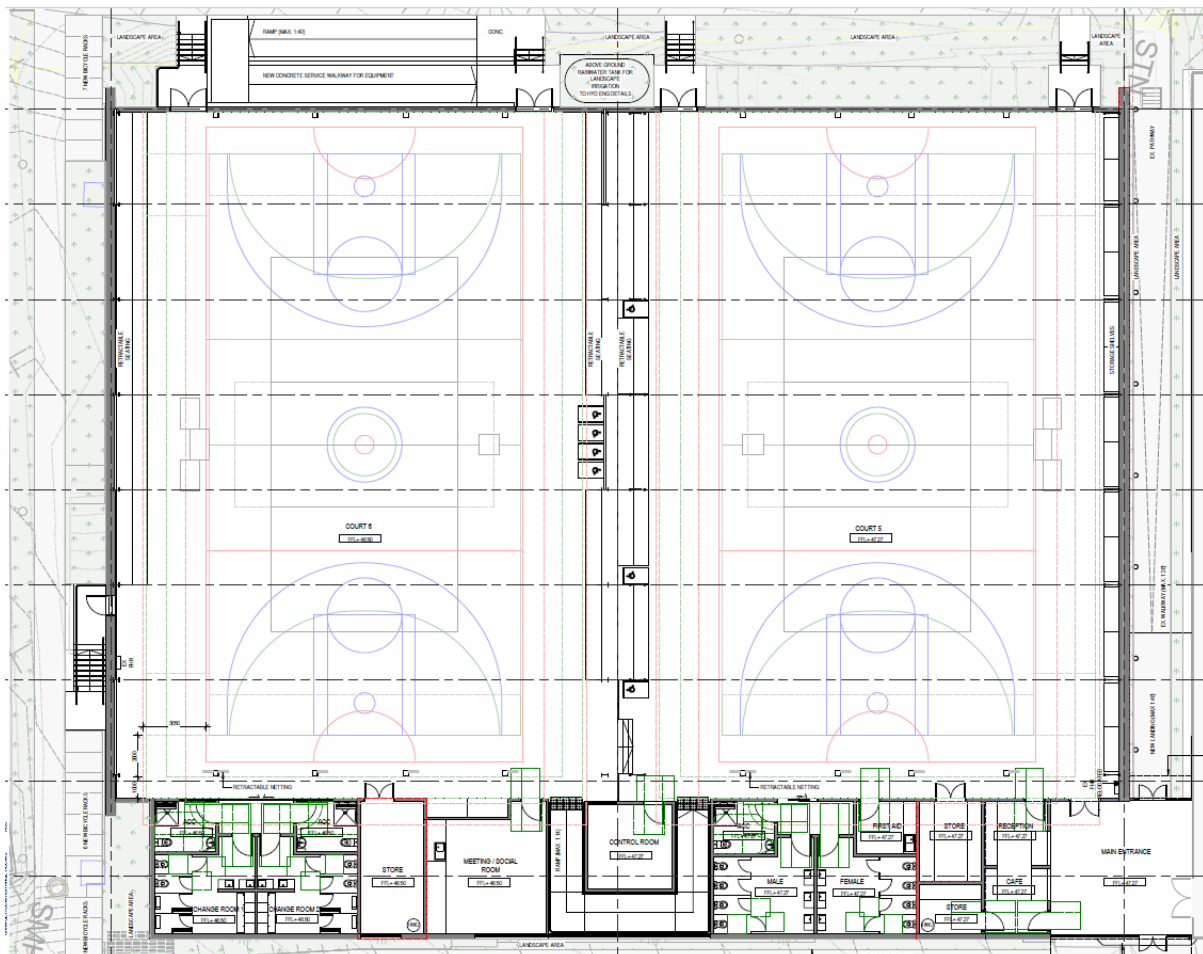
Proposed Ground Floor Plan (Source: CM+)
